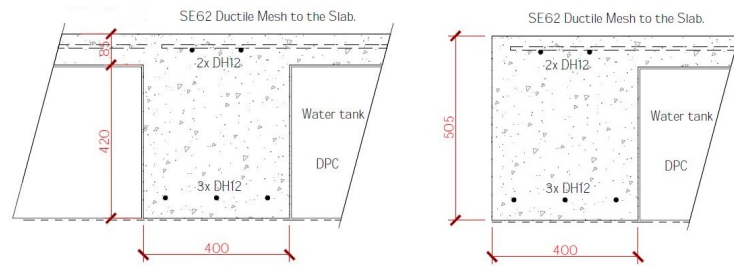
Final Slab Rib and Edge Beam Details
